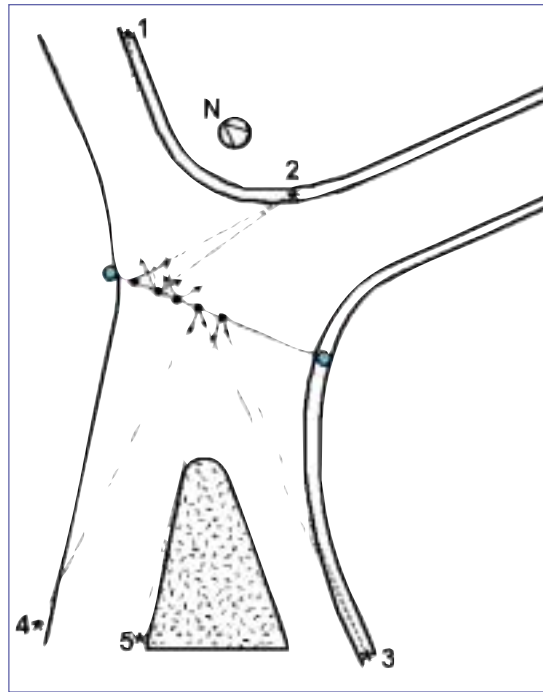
Sketch of Green Island intersection layout, showing measurement locations.
